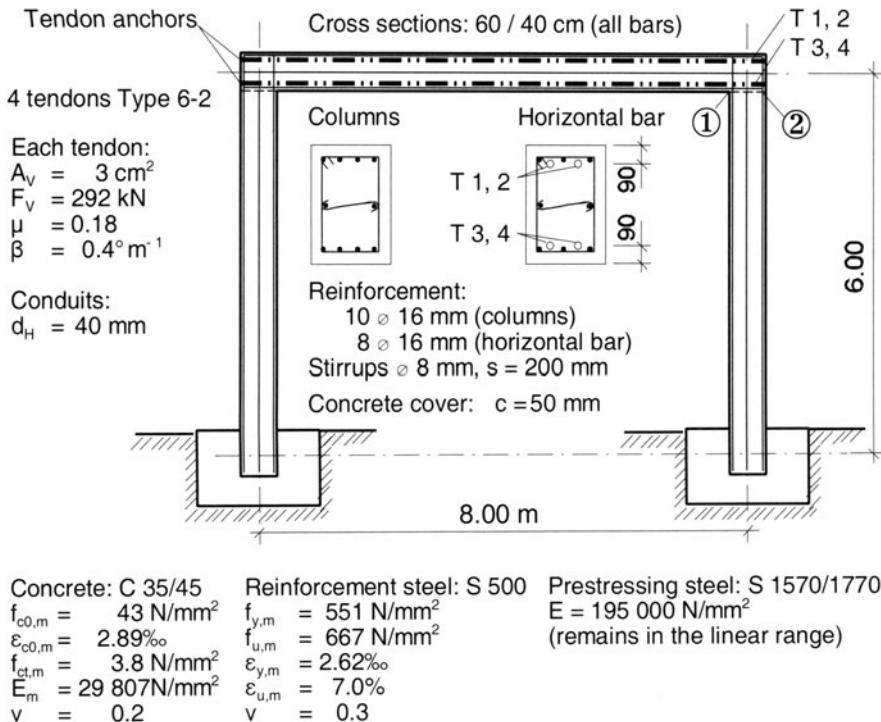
Reinforced concrete frame (plane); structure, cross sections, materials
